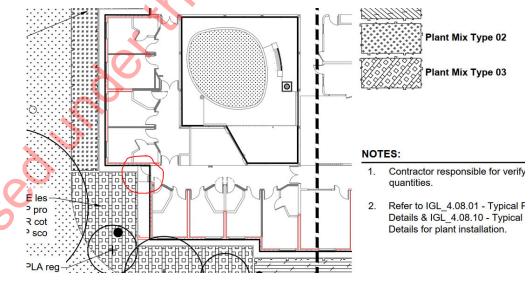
Egress door from the Youth sleeping firecell(IFSC) - Extracted from the landscape plan IGL2.40.03
